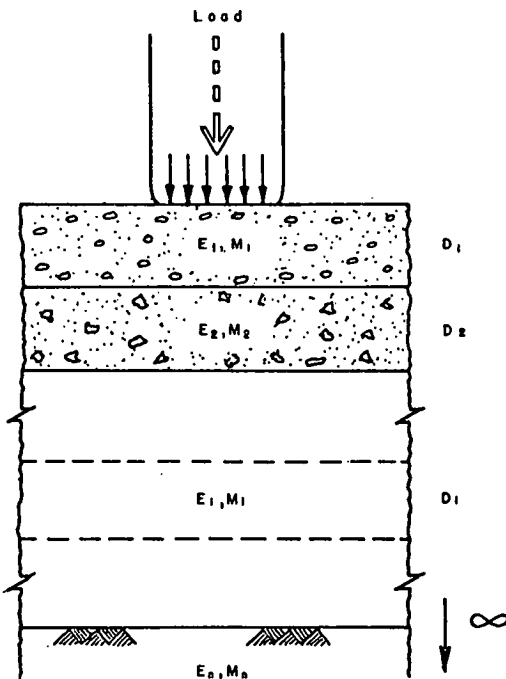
A typical pavement structure cross section showing the elastic parameters.
